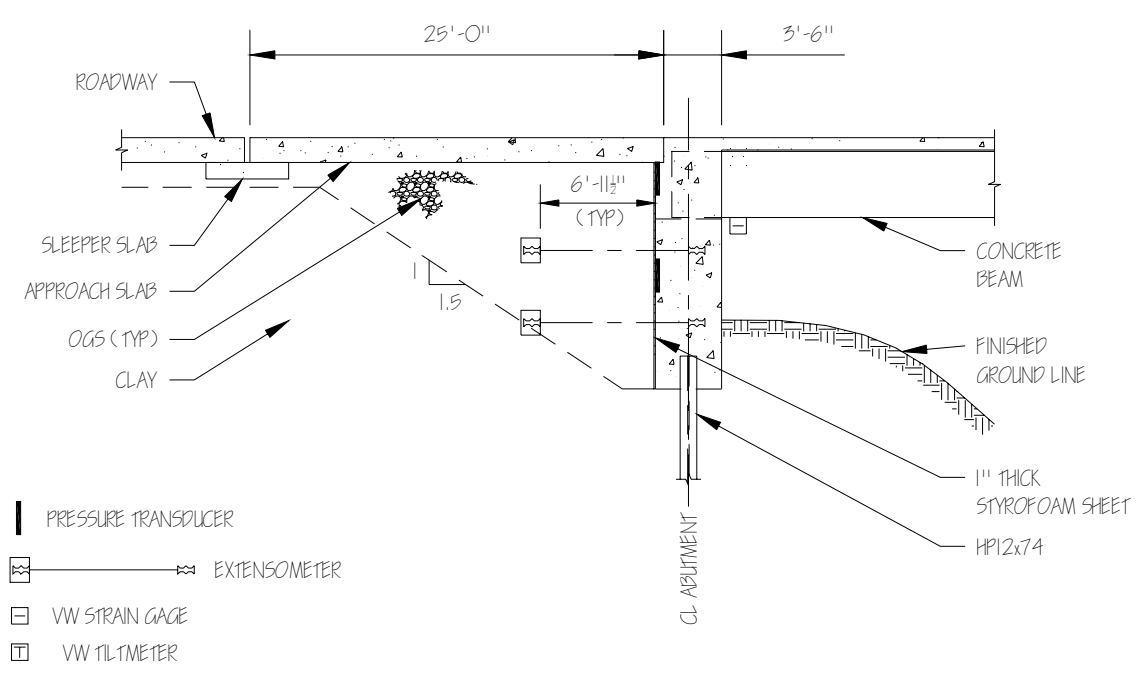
Structure 222 Cross-Section Through Abutment 2 (Section A-A)
